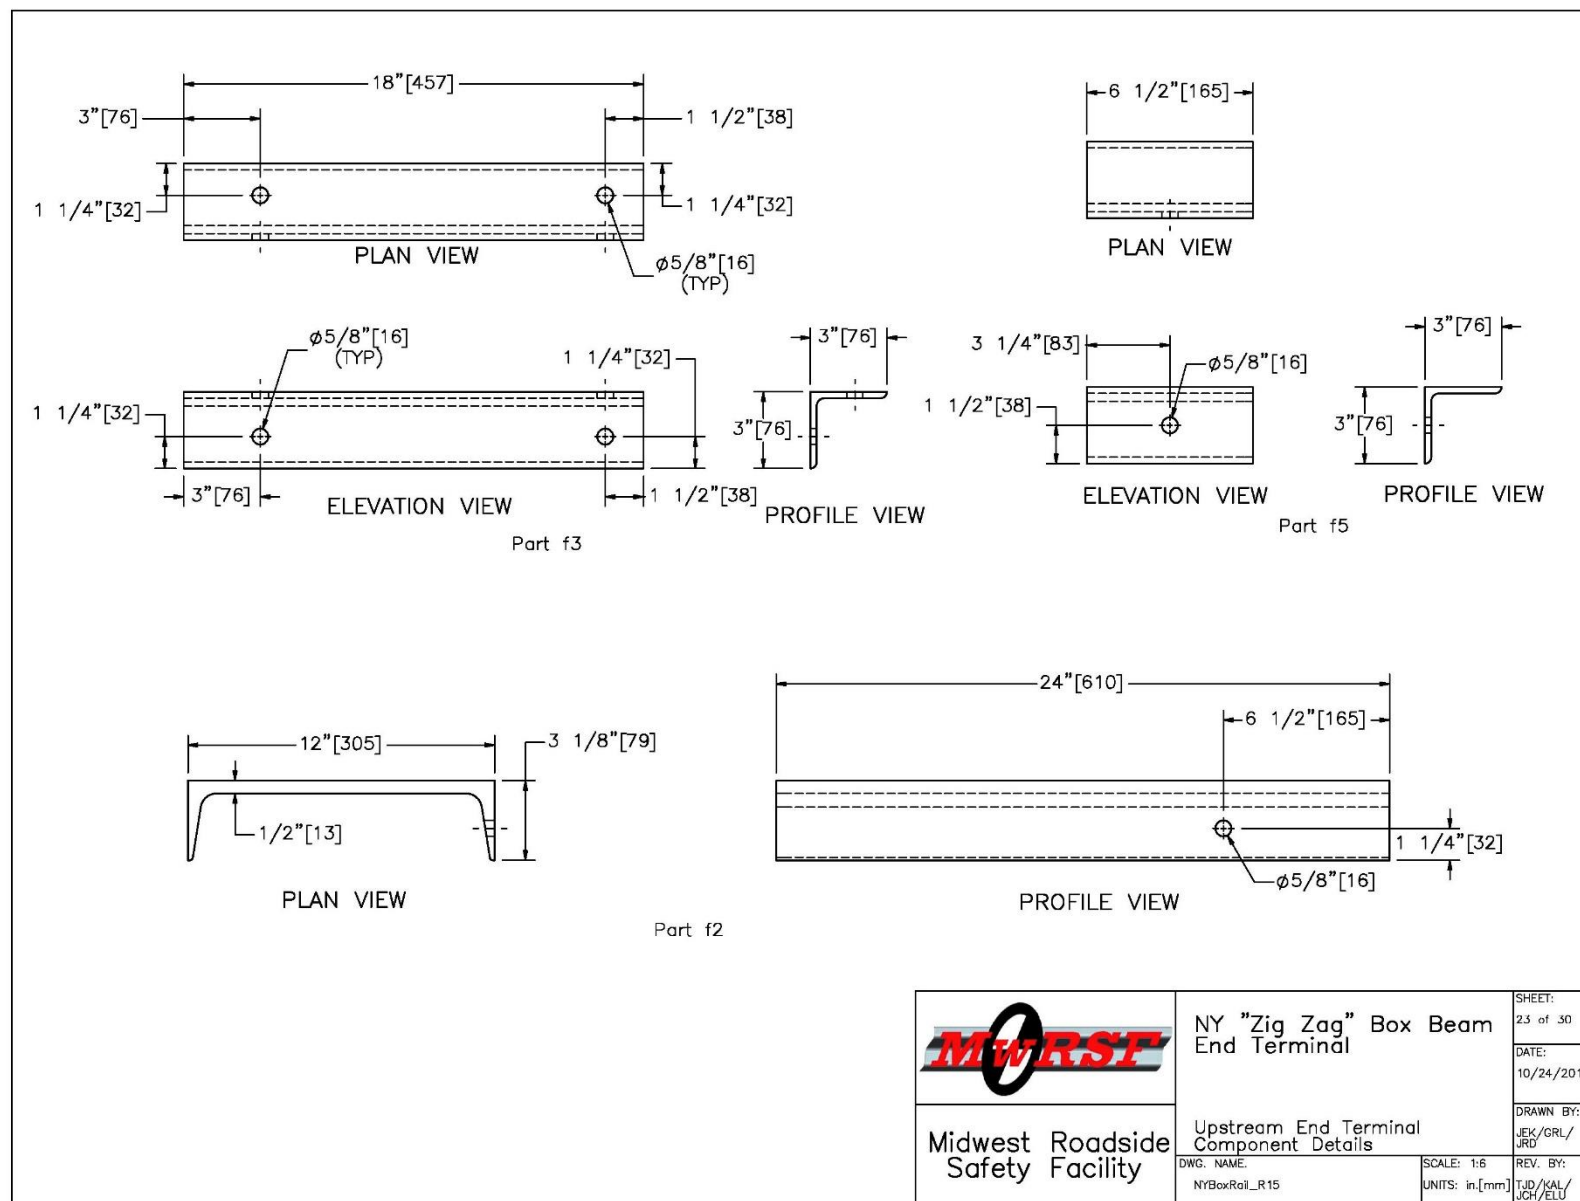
Upstream End Terminal Component Details, Test No. NYT-1
